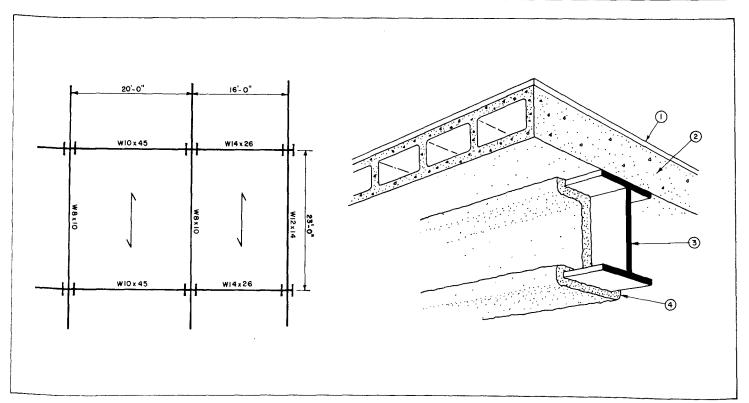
Example Residential High Rise framing plan with precast concrete floor slab.
